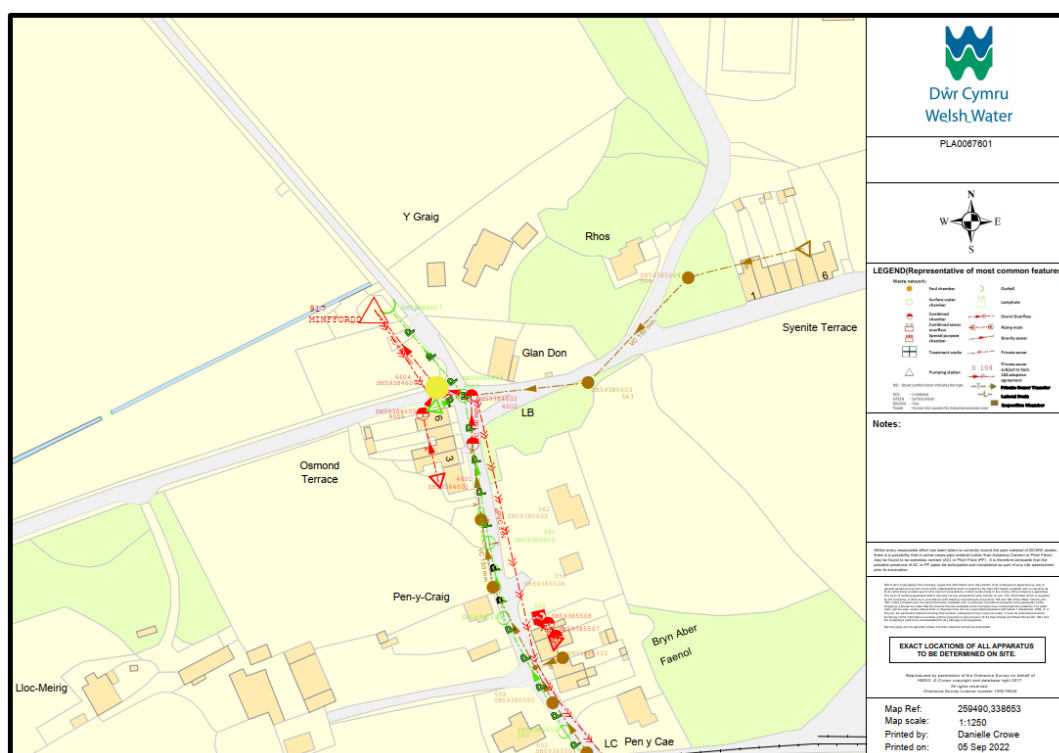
Public Sewerage adjacent to the Garth site
